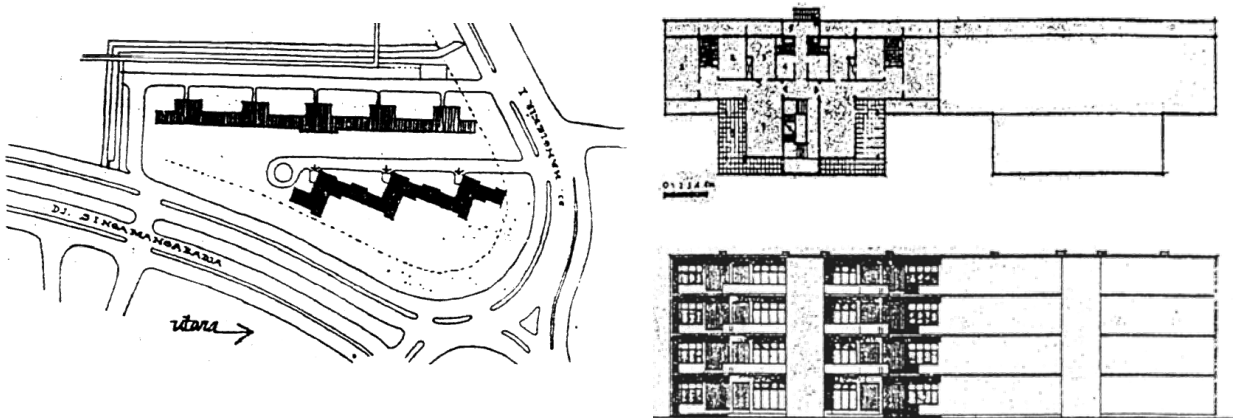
Site plan, ground floor plan, and elevation of the first apartment buildings in Jakarta.
